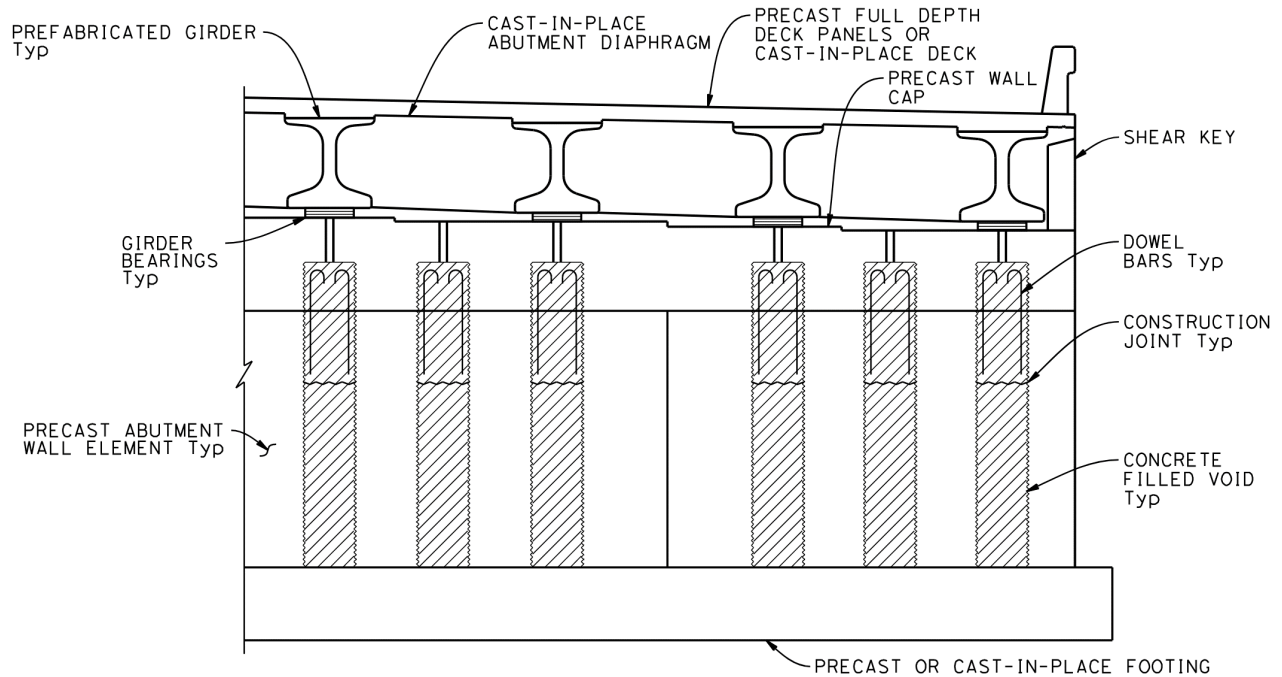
Seat Abutment with Precast Abutment Wall Elements
